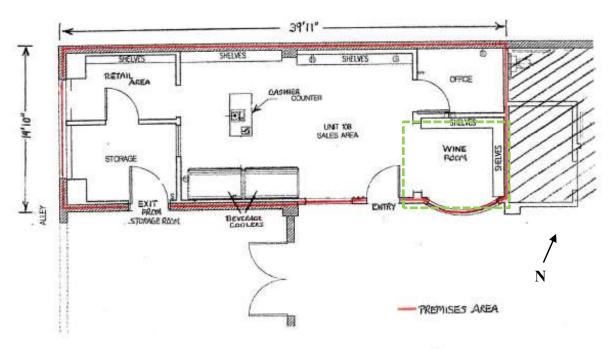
Convenience Store Floor Plan Source: MAVAZO INC
